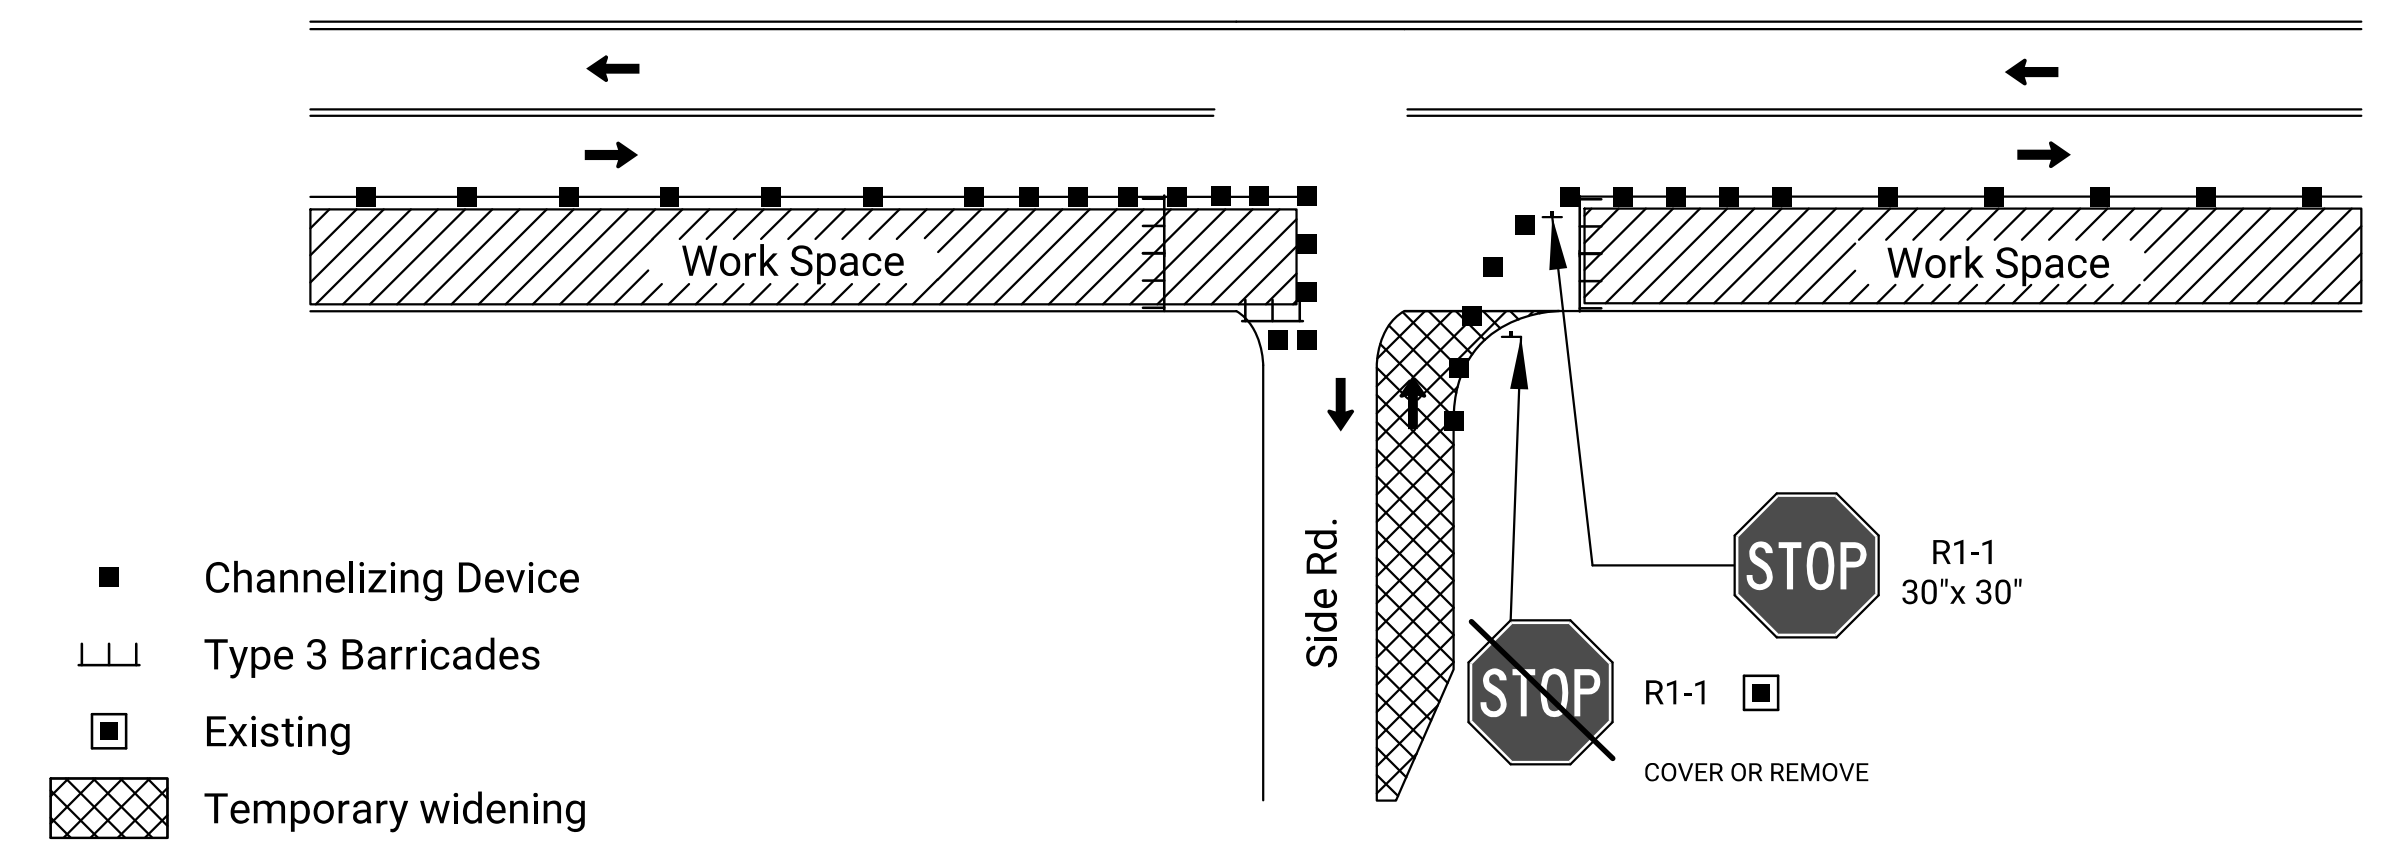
SIDE ROAD OR ENTRANCE CONSTRUCTED HALF AT A TIME: TWO WAY TRAFFIC REQUIRED
